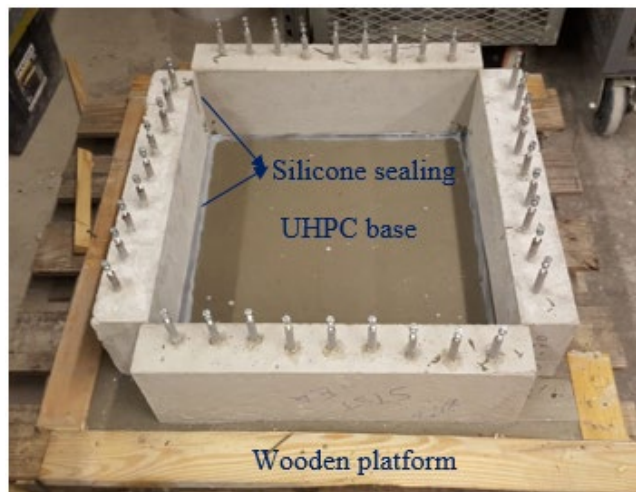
Custom made corrosion test sample molds with epoxy-coated bars at ends
